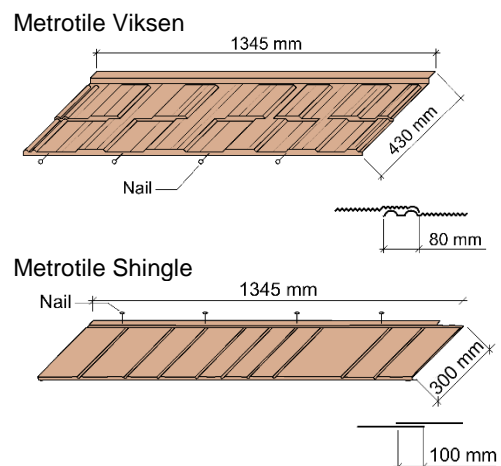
Standard types metal sheet tiles with related overlap and nail positions.
